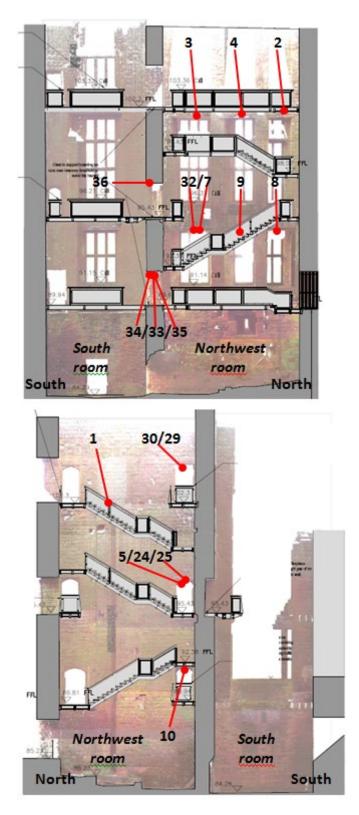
/b: Elevations through the walls to help locate sampled timbers (after Purcell Miller Tritton)
